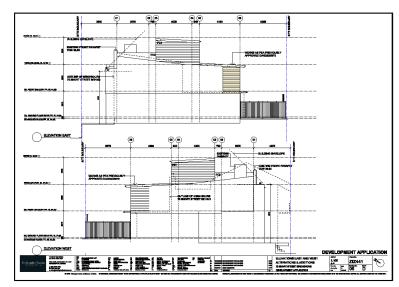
Elevation of proposed works, indicating neighbouring dwellings and view towards the addition.
